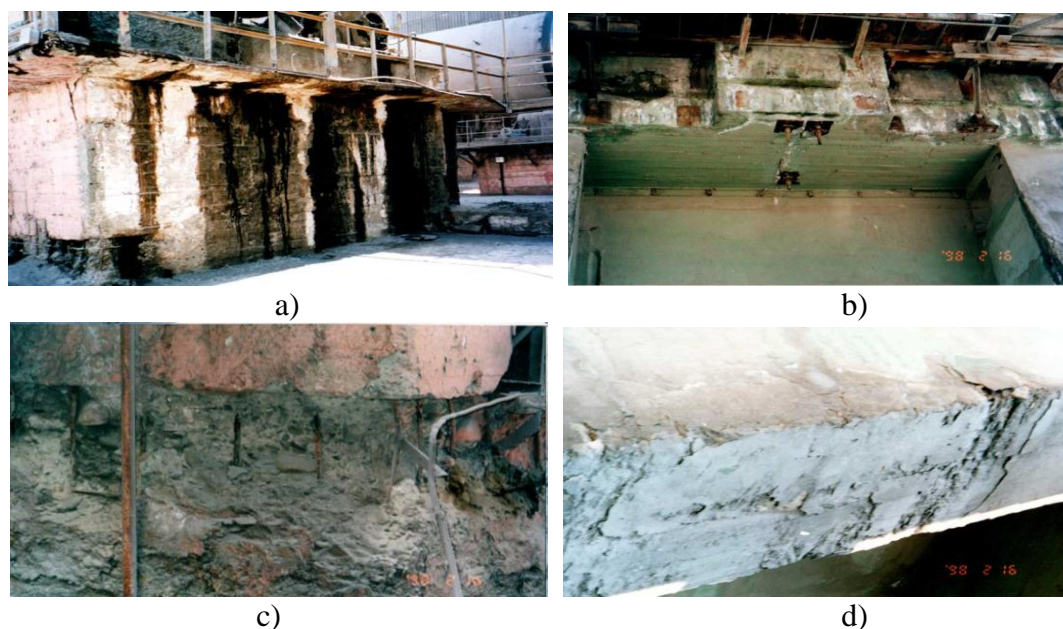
Degradation of load-bearing reinforced concrete structures of rotary kilns of a cement plant (Lviv region, Mykolaiv, 1998):
